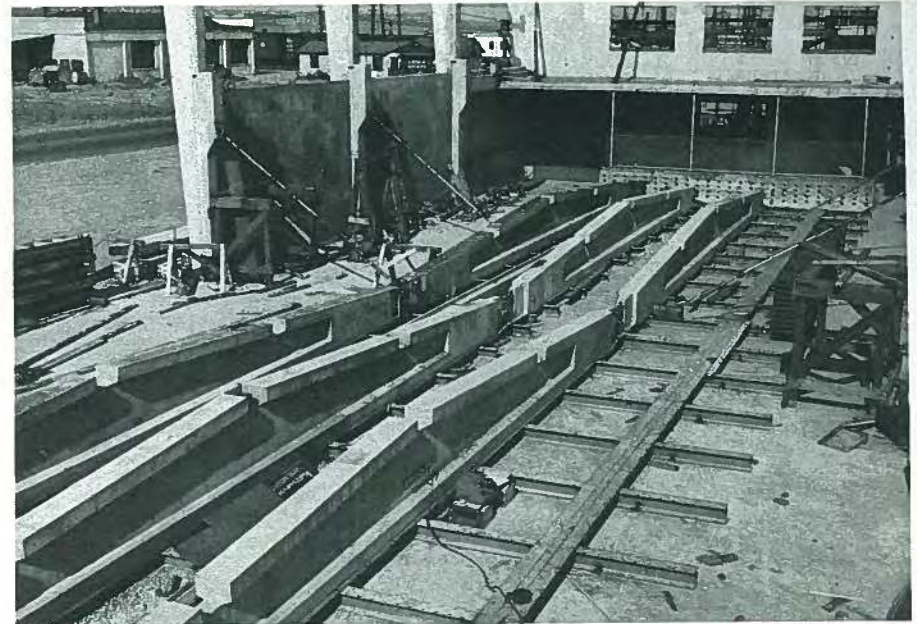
105-ft (32 m) long pretensioning bed showing freshly cast prestressed roof girders for new Concrete Engineering Company plant in Tacoma (1951).
